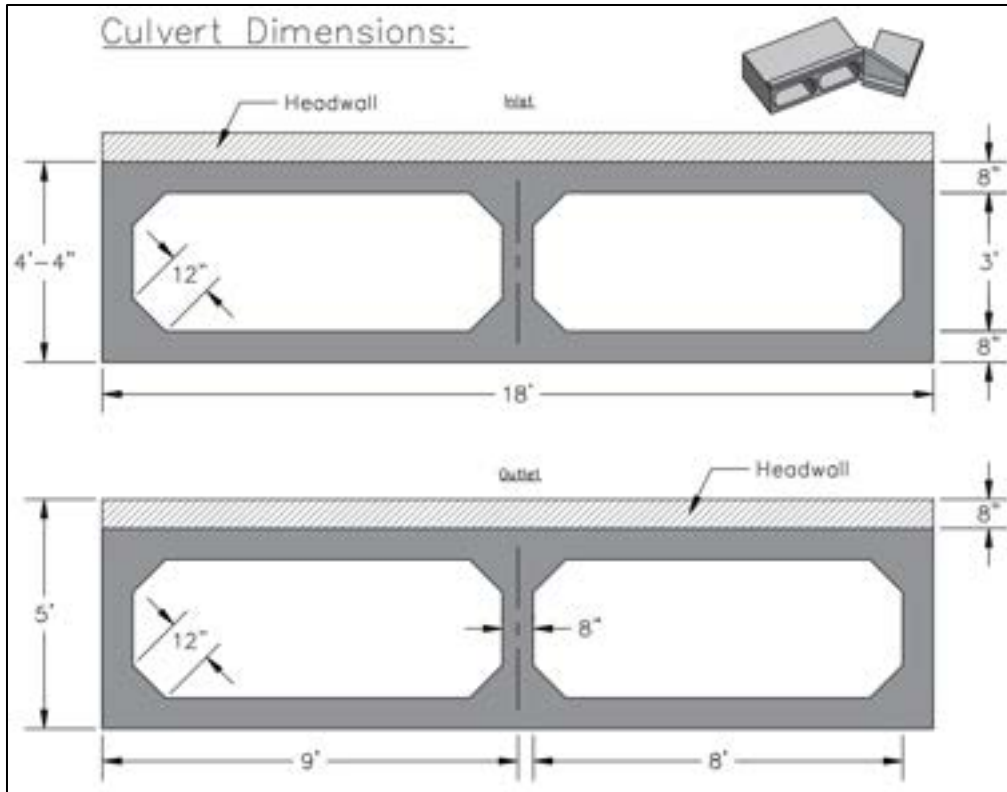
Proposed cross-section of the precast twin-cell culvert
